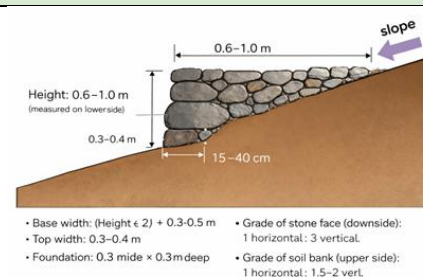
Cross-sectional design of a stone bund showing foundation trench, stone arrangement and slope alignment.
